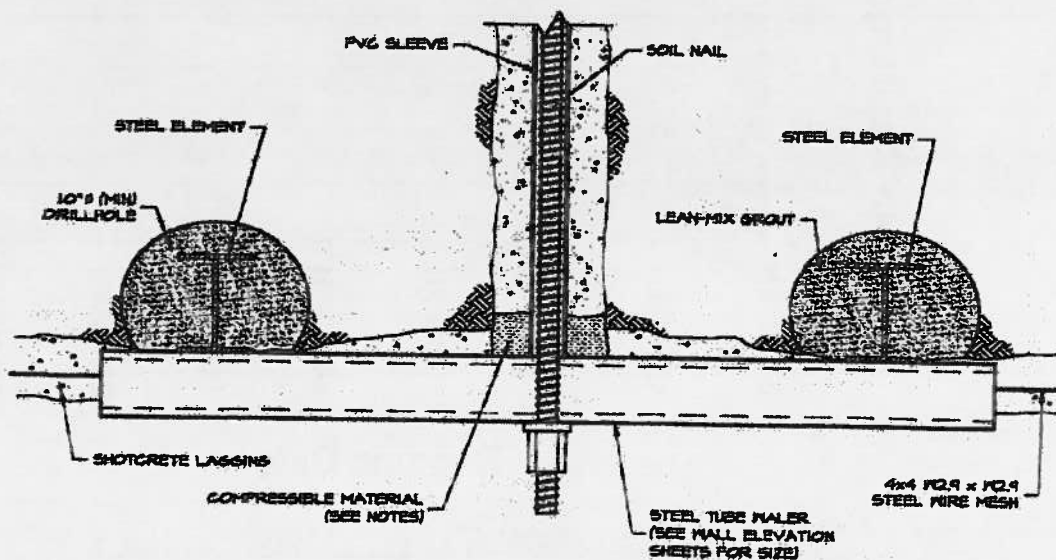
Horizontal Section Depicting Vertical Elements And Soil Nails
